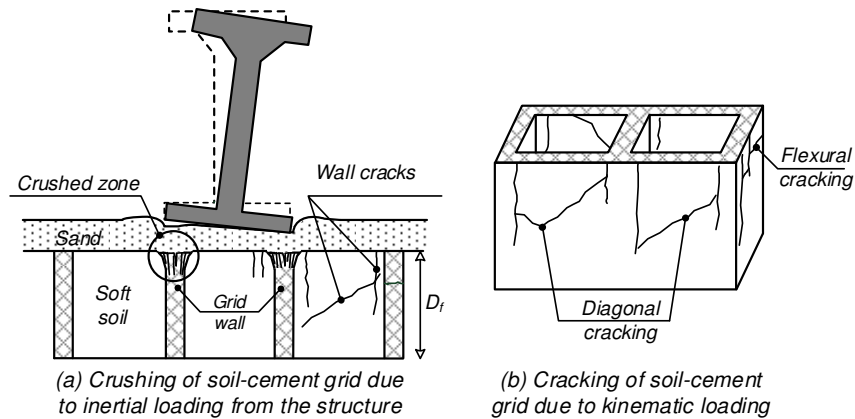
Schematic of possible damage to a soil-cement grid supporting a structure on a shallow foundation during seismic loading
